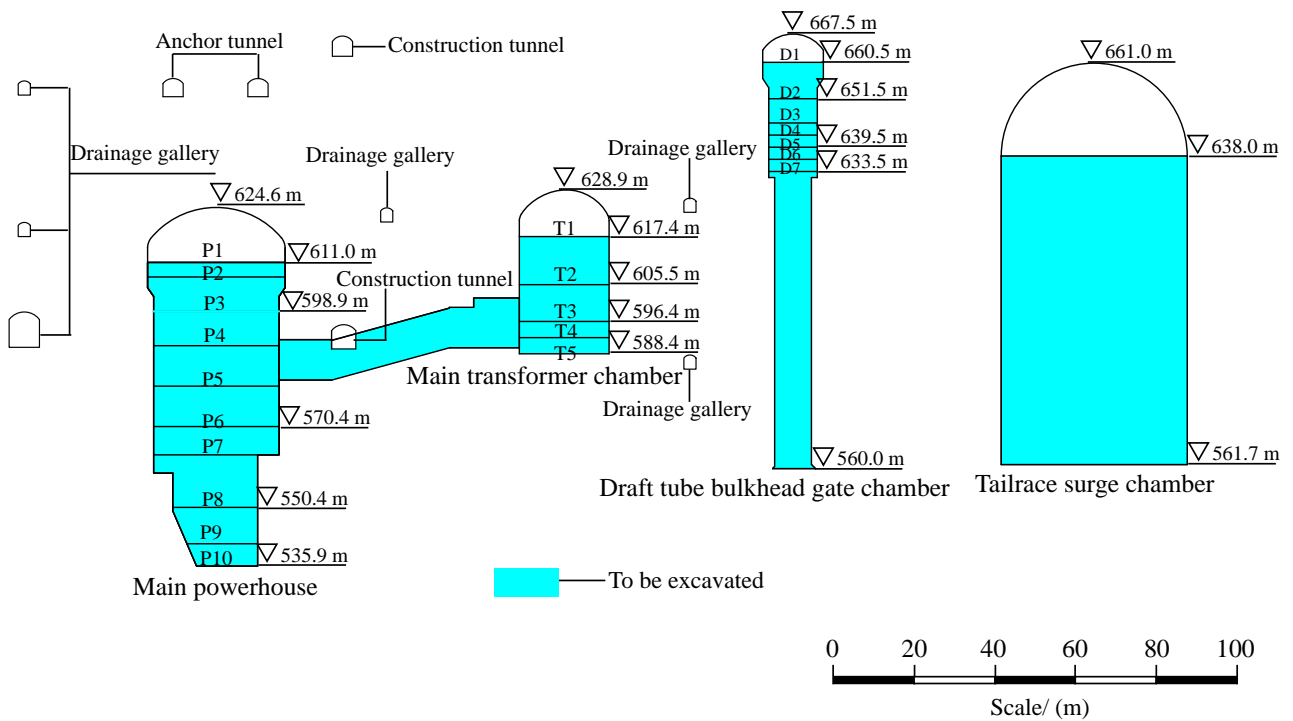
Specific stratified excavation scheme of the underground powerhouse caverns.
